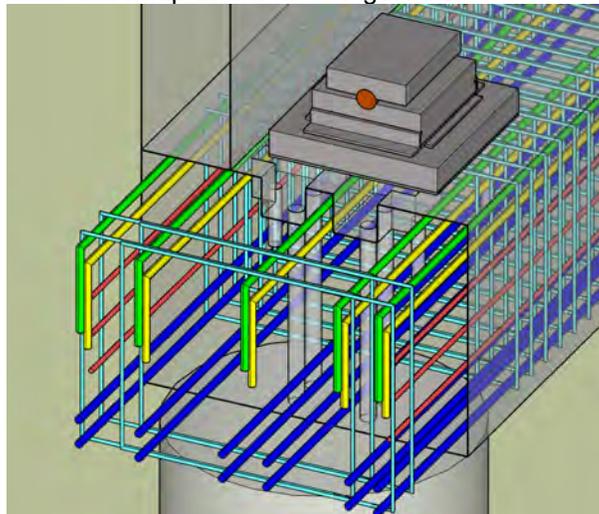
Precast Seat-to-Drilled shaft connection showing reinforcement and hardware ducts
